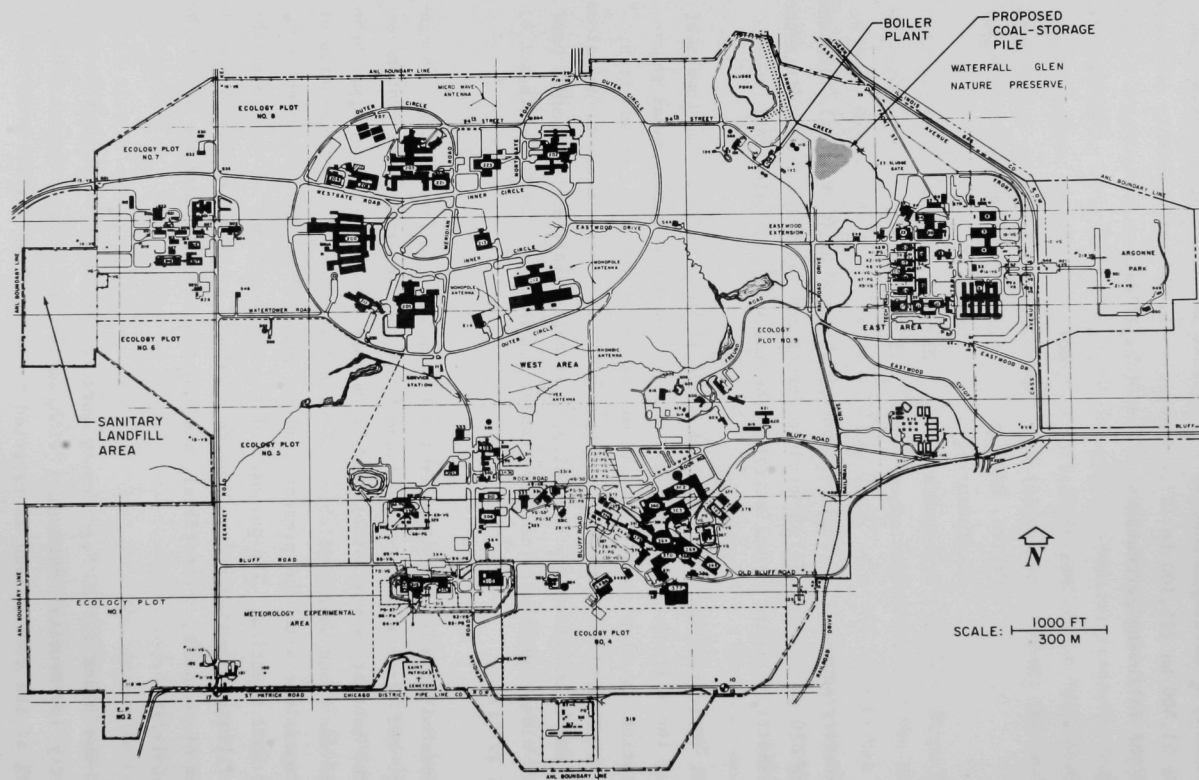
ANL Site Plan Showing Locations of Sanitary Landfill, Boiler Plant, and Proposed Coal-Storage Pile.
